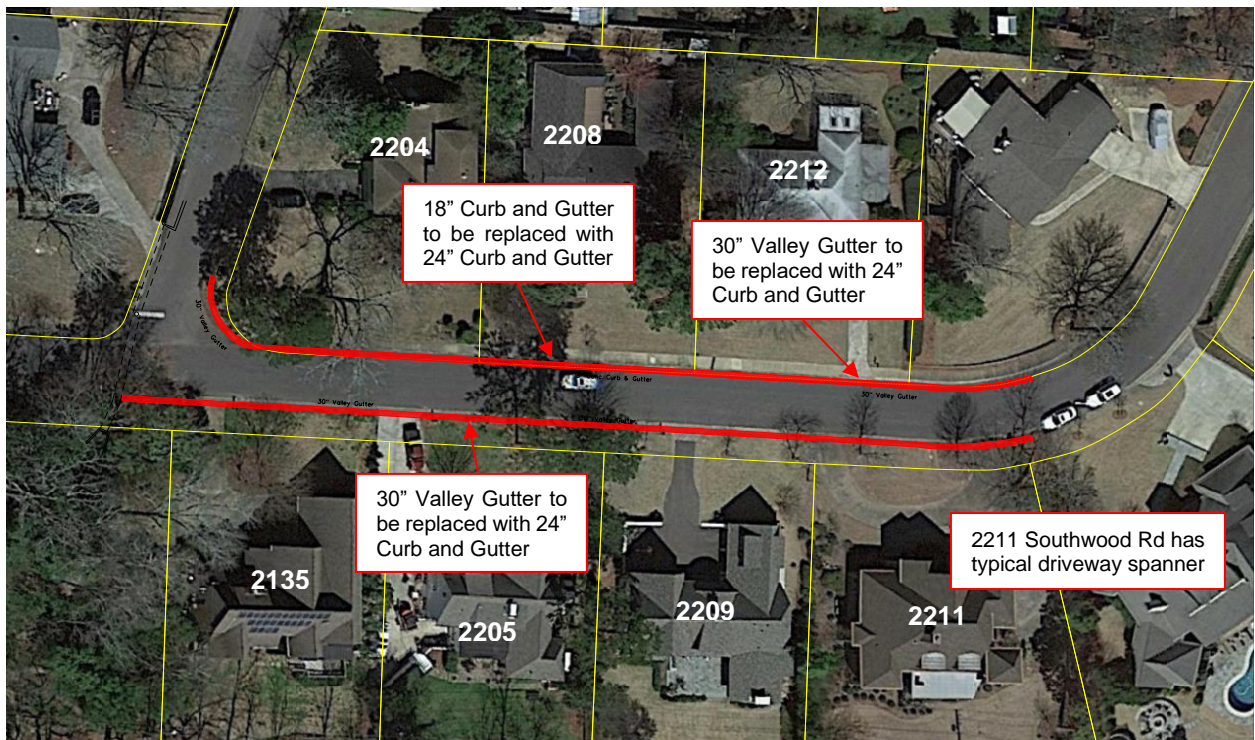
Red hatch illustrates the section of Valley Gutters that need to be converted to the 24” curb and gutter on Southwood Road.
